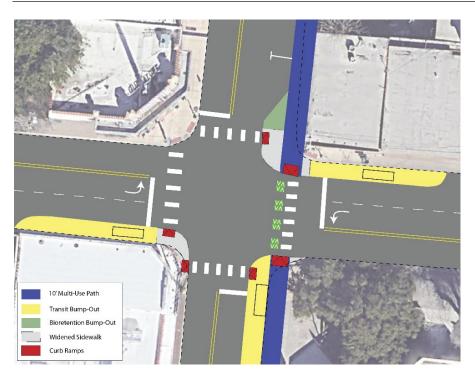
Alternative 1 – Conceptual Intersection Layout at Brazos Street & Guadalupe Street
